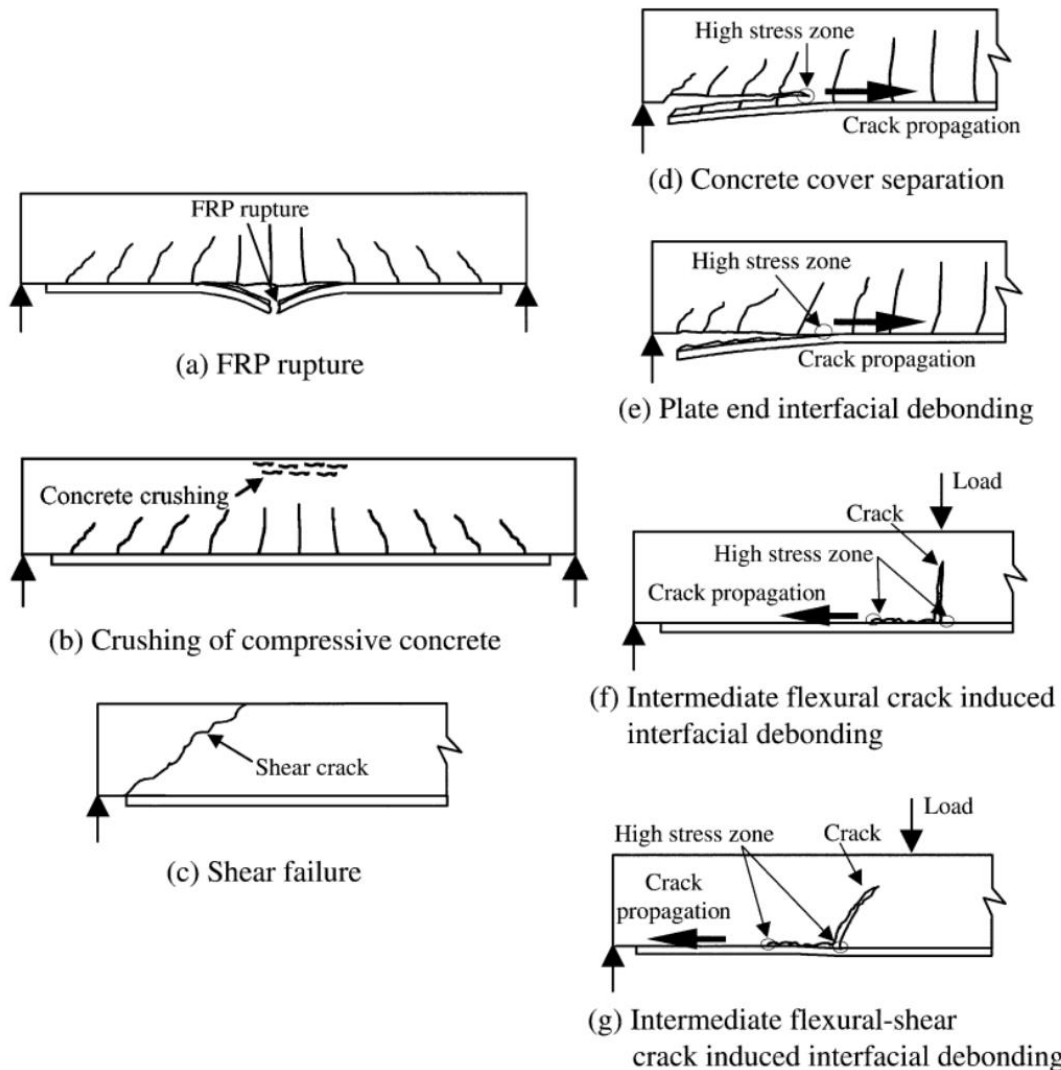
Failure modes of flexurally strengthened reinforced concrete beam with FRP-sheet (Teng et al., 2003).
